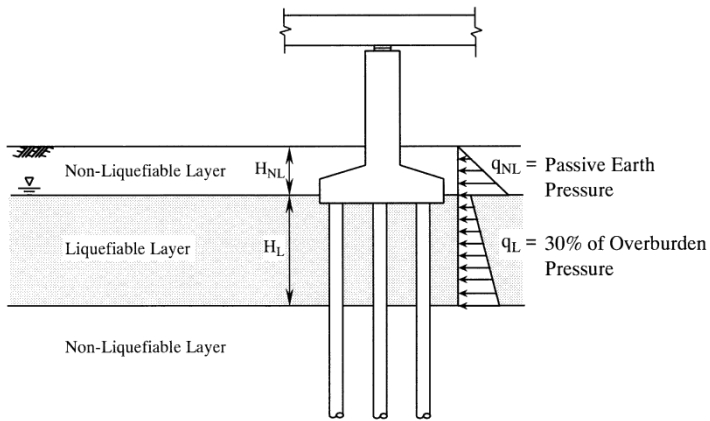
Idealization of ground flow force for seismic design of bridge pier foundation
